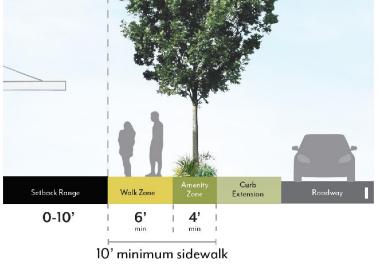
Sidewalks - Mixed Use Neighborhood (MUN)
